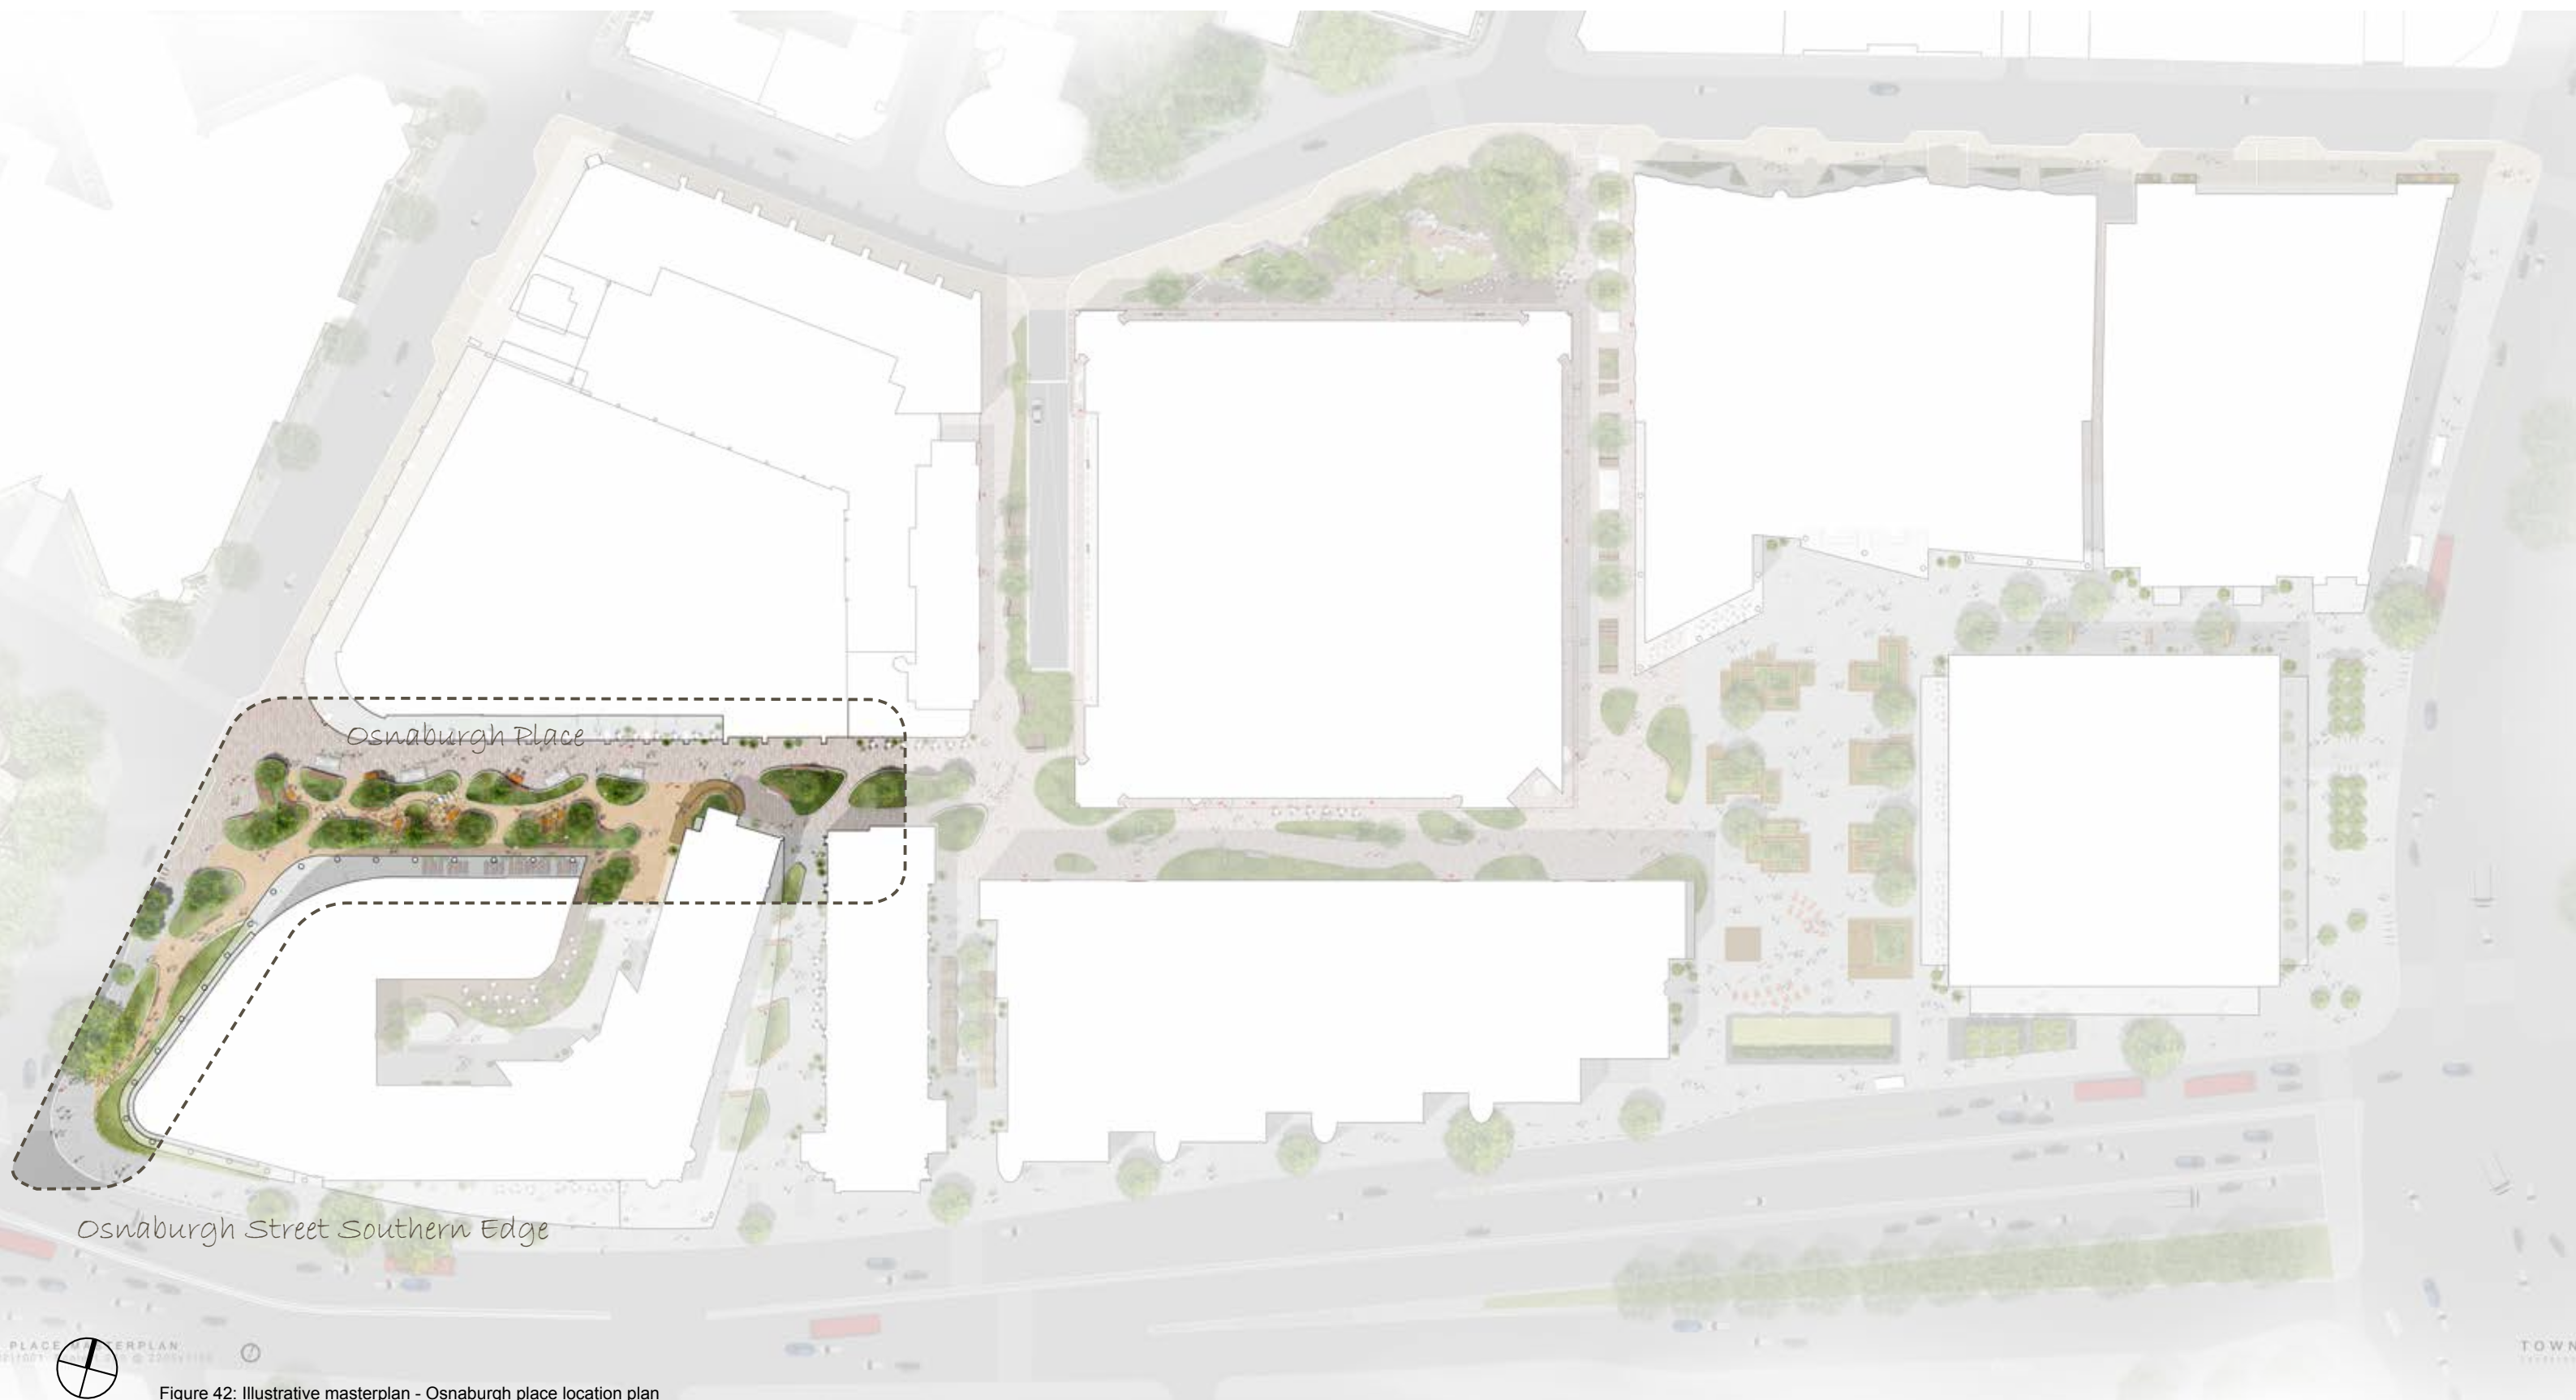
Illustrative masterplan - Osnaburgh place location plan
